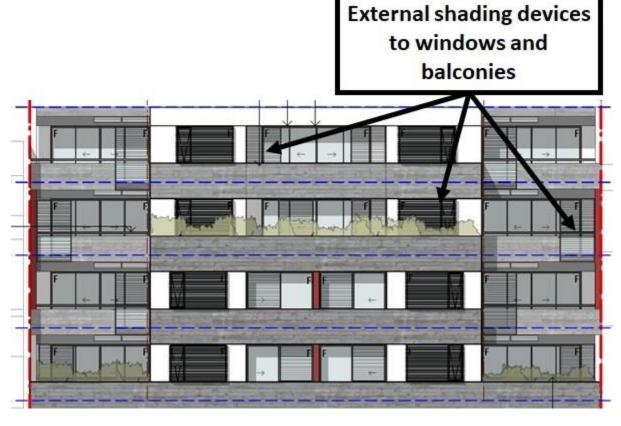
Proposed sun-shading to north-west (Birmingham Street) elevation.
